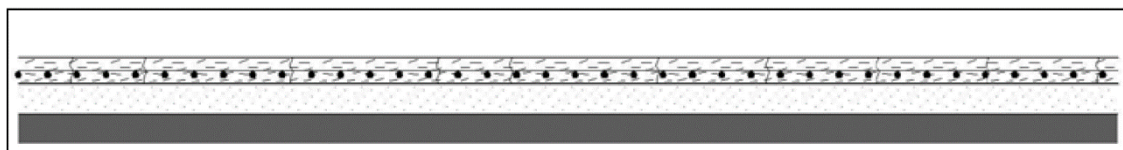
Ultra-Thin Continuously Reinforced Concrete (UTCRC) pavement (Source: SAPEM, 2013d)
